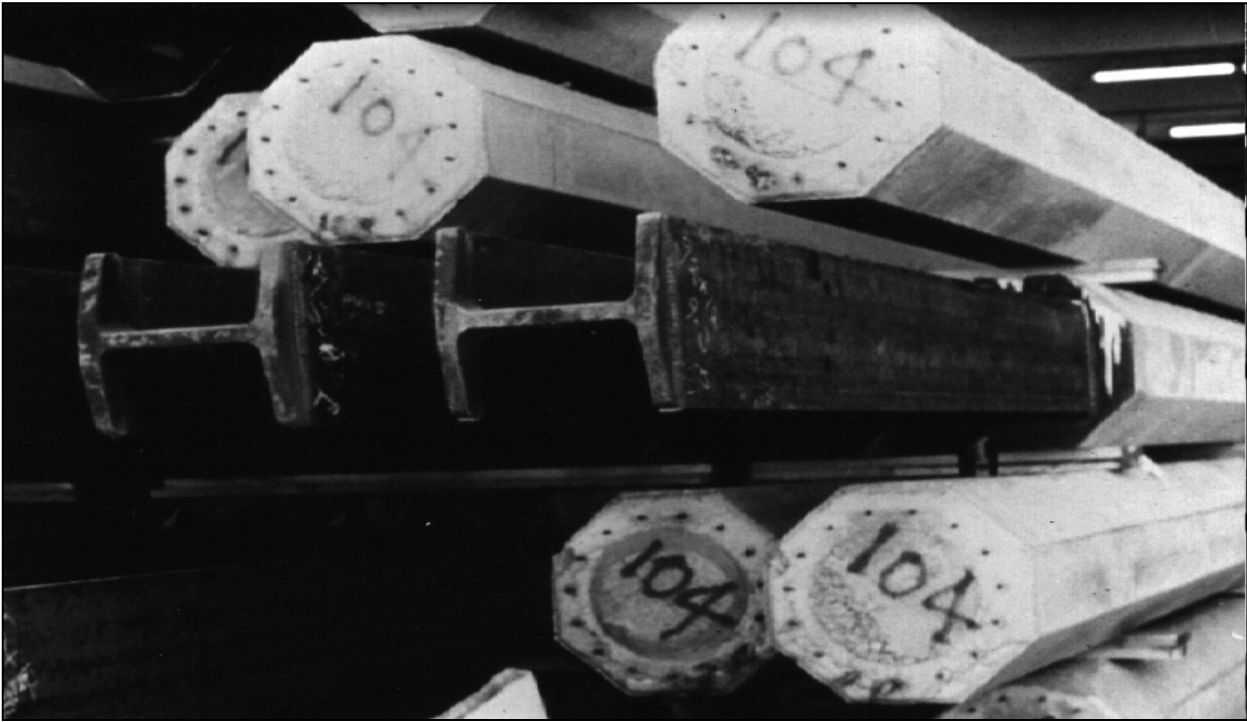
Steel H-pile Tip for Precast Concrete Pile
